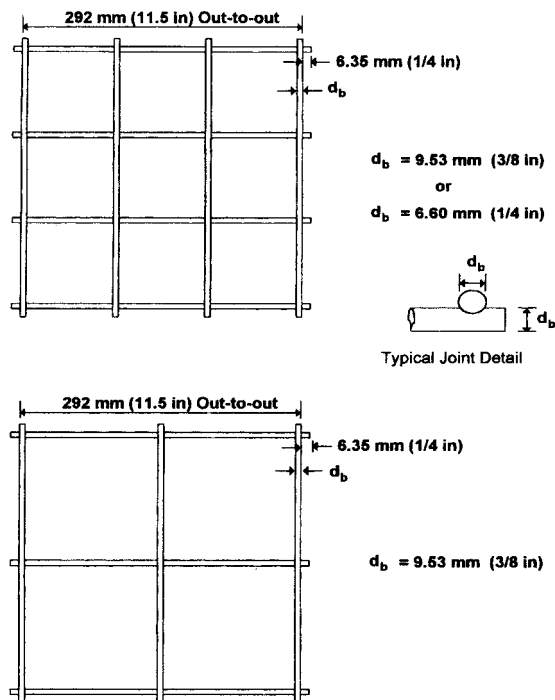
Geometric details of welded reinforcement grids.
